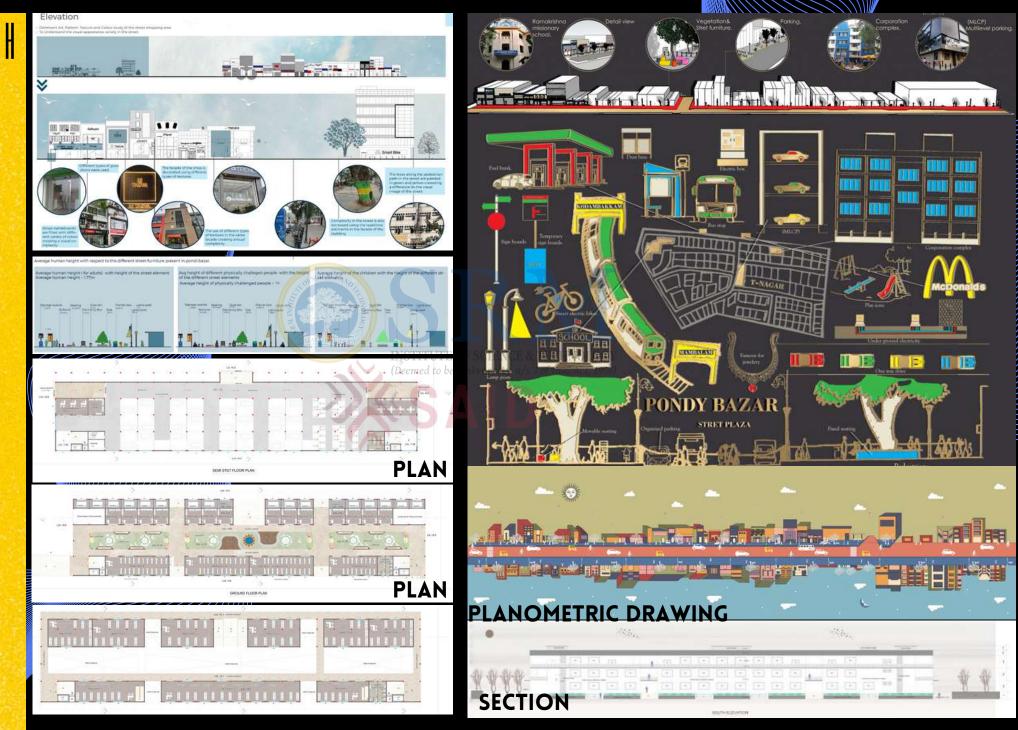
DETAILING VERNACULAR LANGUAGE I PUBLIC BUILD
